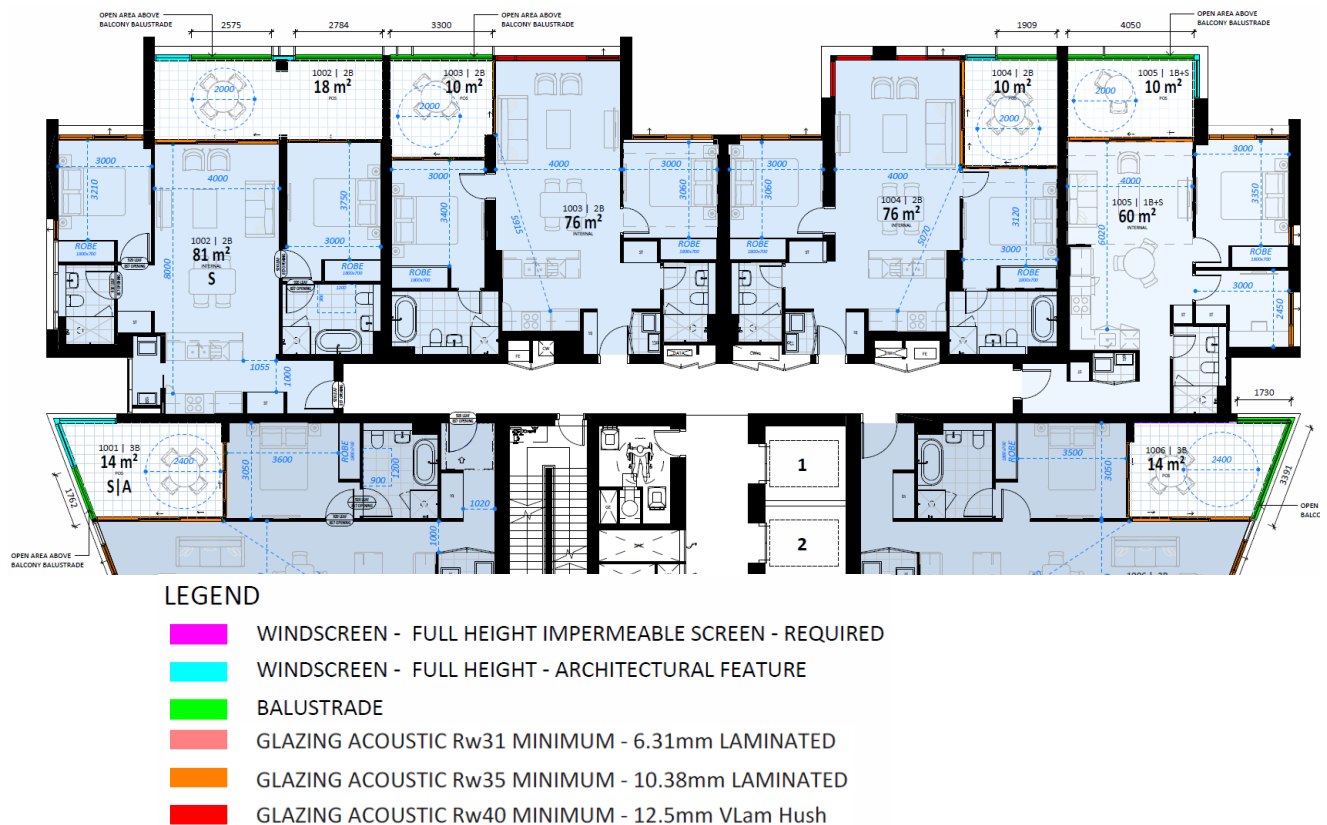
Extract from the Level 10 Floor Plan (typical of Levels 6-21) showing the glazing treatment to the habitable room and balconies to address wind and acoustic impacts.
